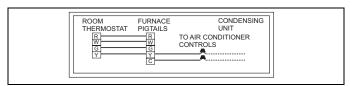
Wiring for Standard Heat-Cool Thermostat
